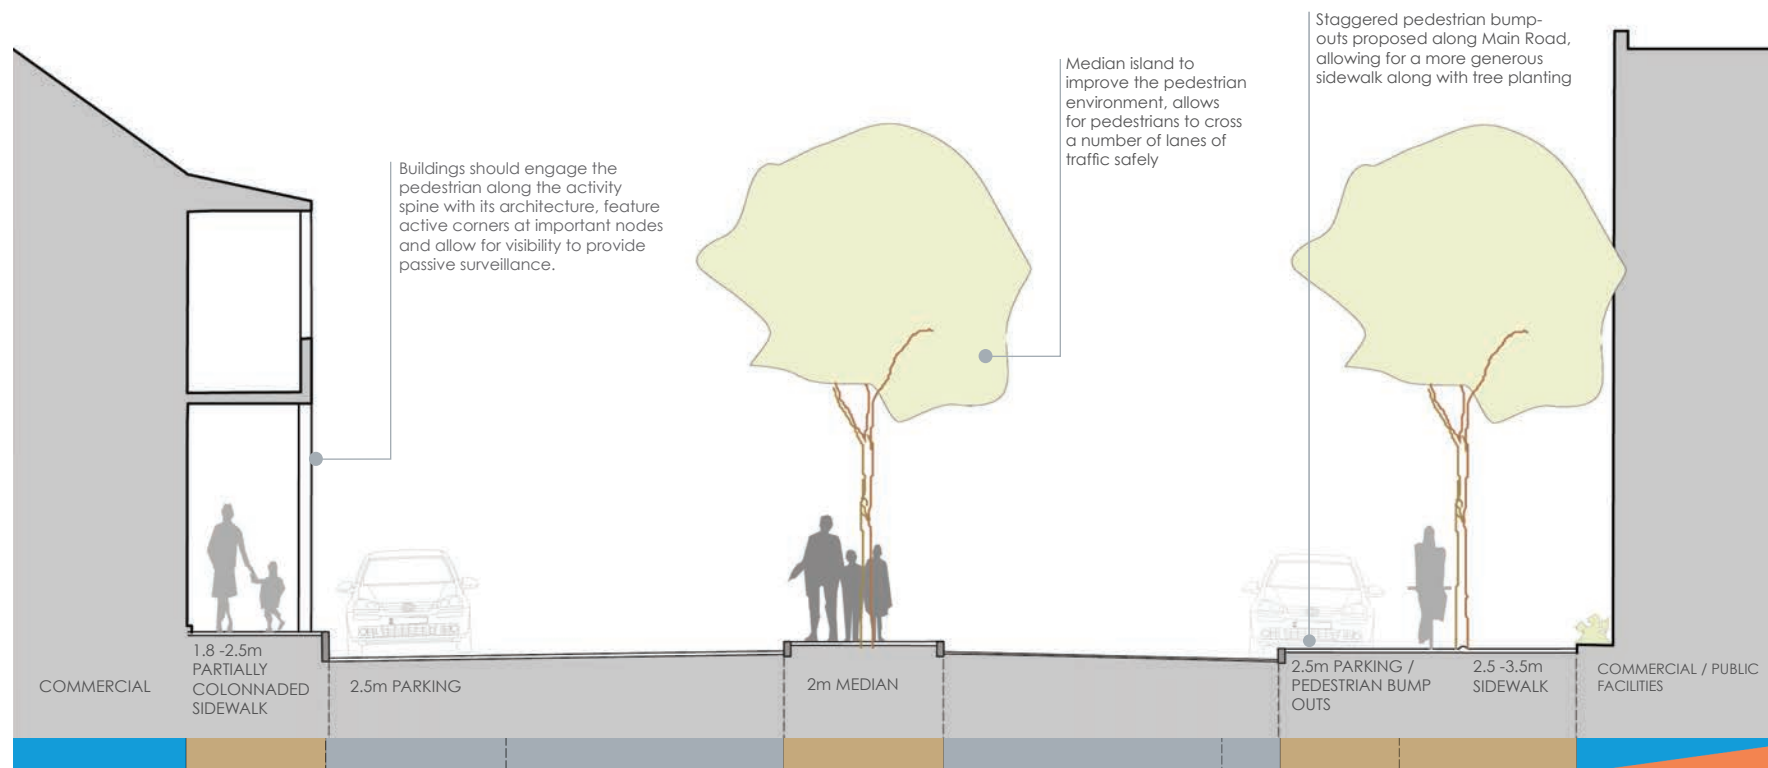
Main Road (between Park Avenue and Harbour Road), Proposals
